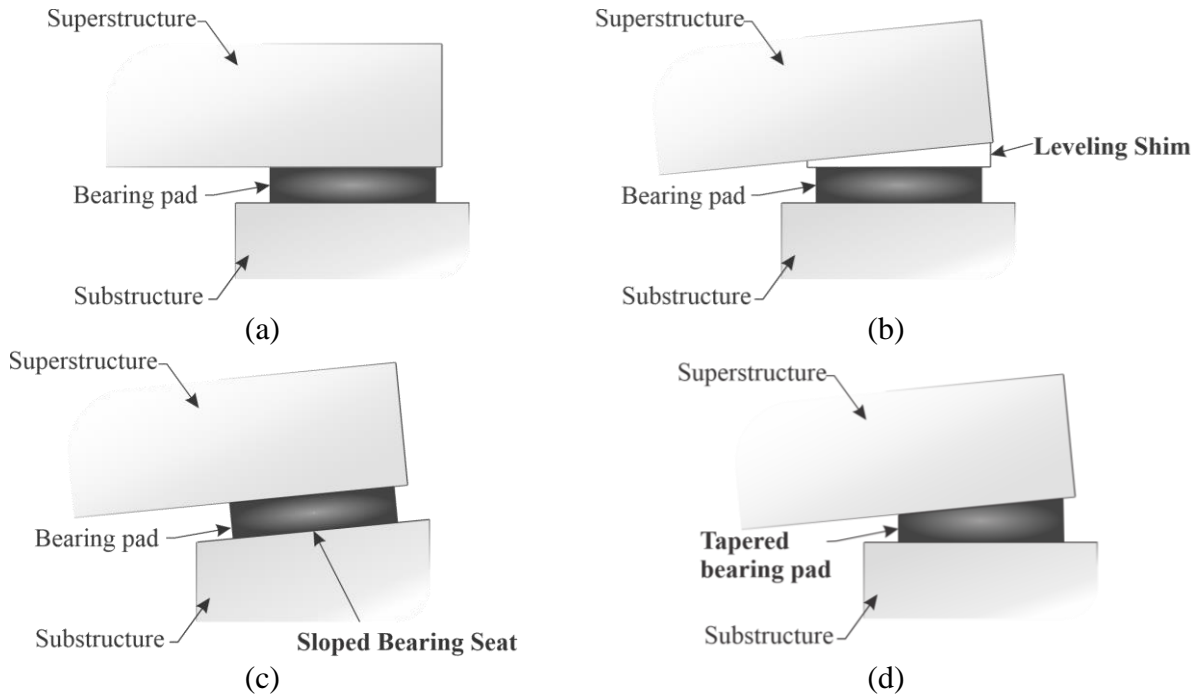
Bearing pad and bridge structure configurations using: (a) Flat bearing pad; (b) Leveling shim and flat bearing pad; (c) Bearing pad and sloped seat; (d) Tapered bearing pad
